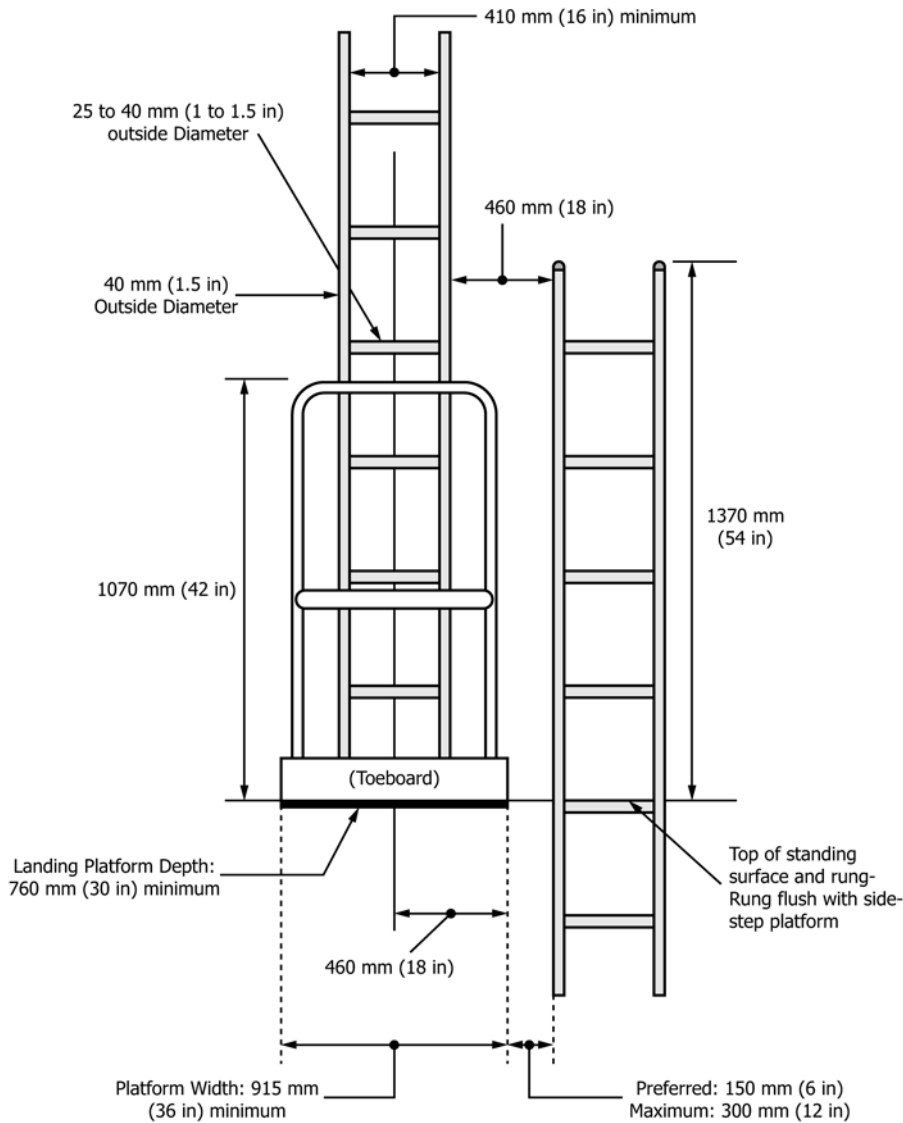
Dimensions for a Vertical Ladder Arrangement
